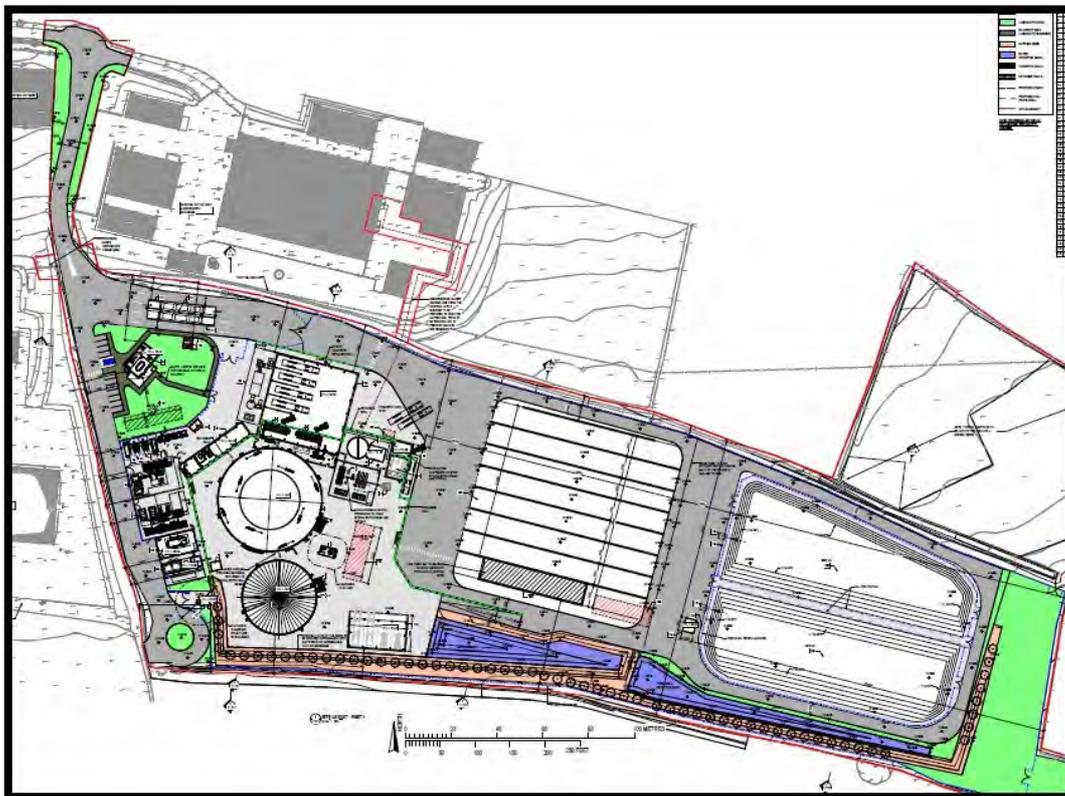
GF Layout Plans (Refer Appendix A)
